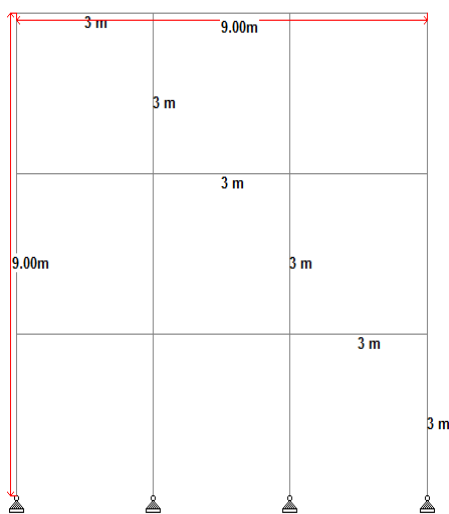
Dimension of the reference building    Fig. 3.2.2: STAAD.Pro 3D rendered view
